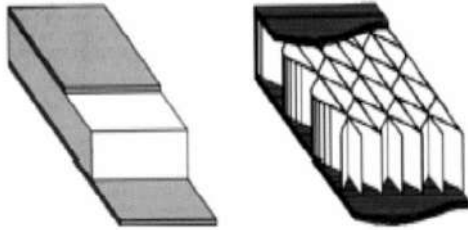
Examples of types of bridge structures with FRP decks [1]
